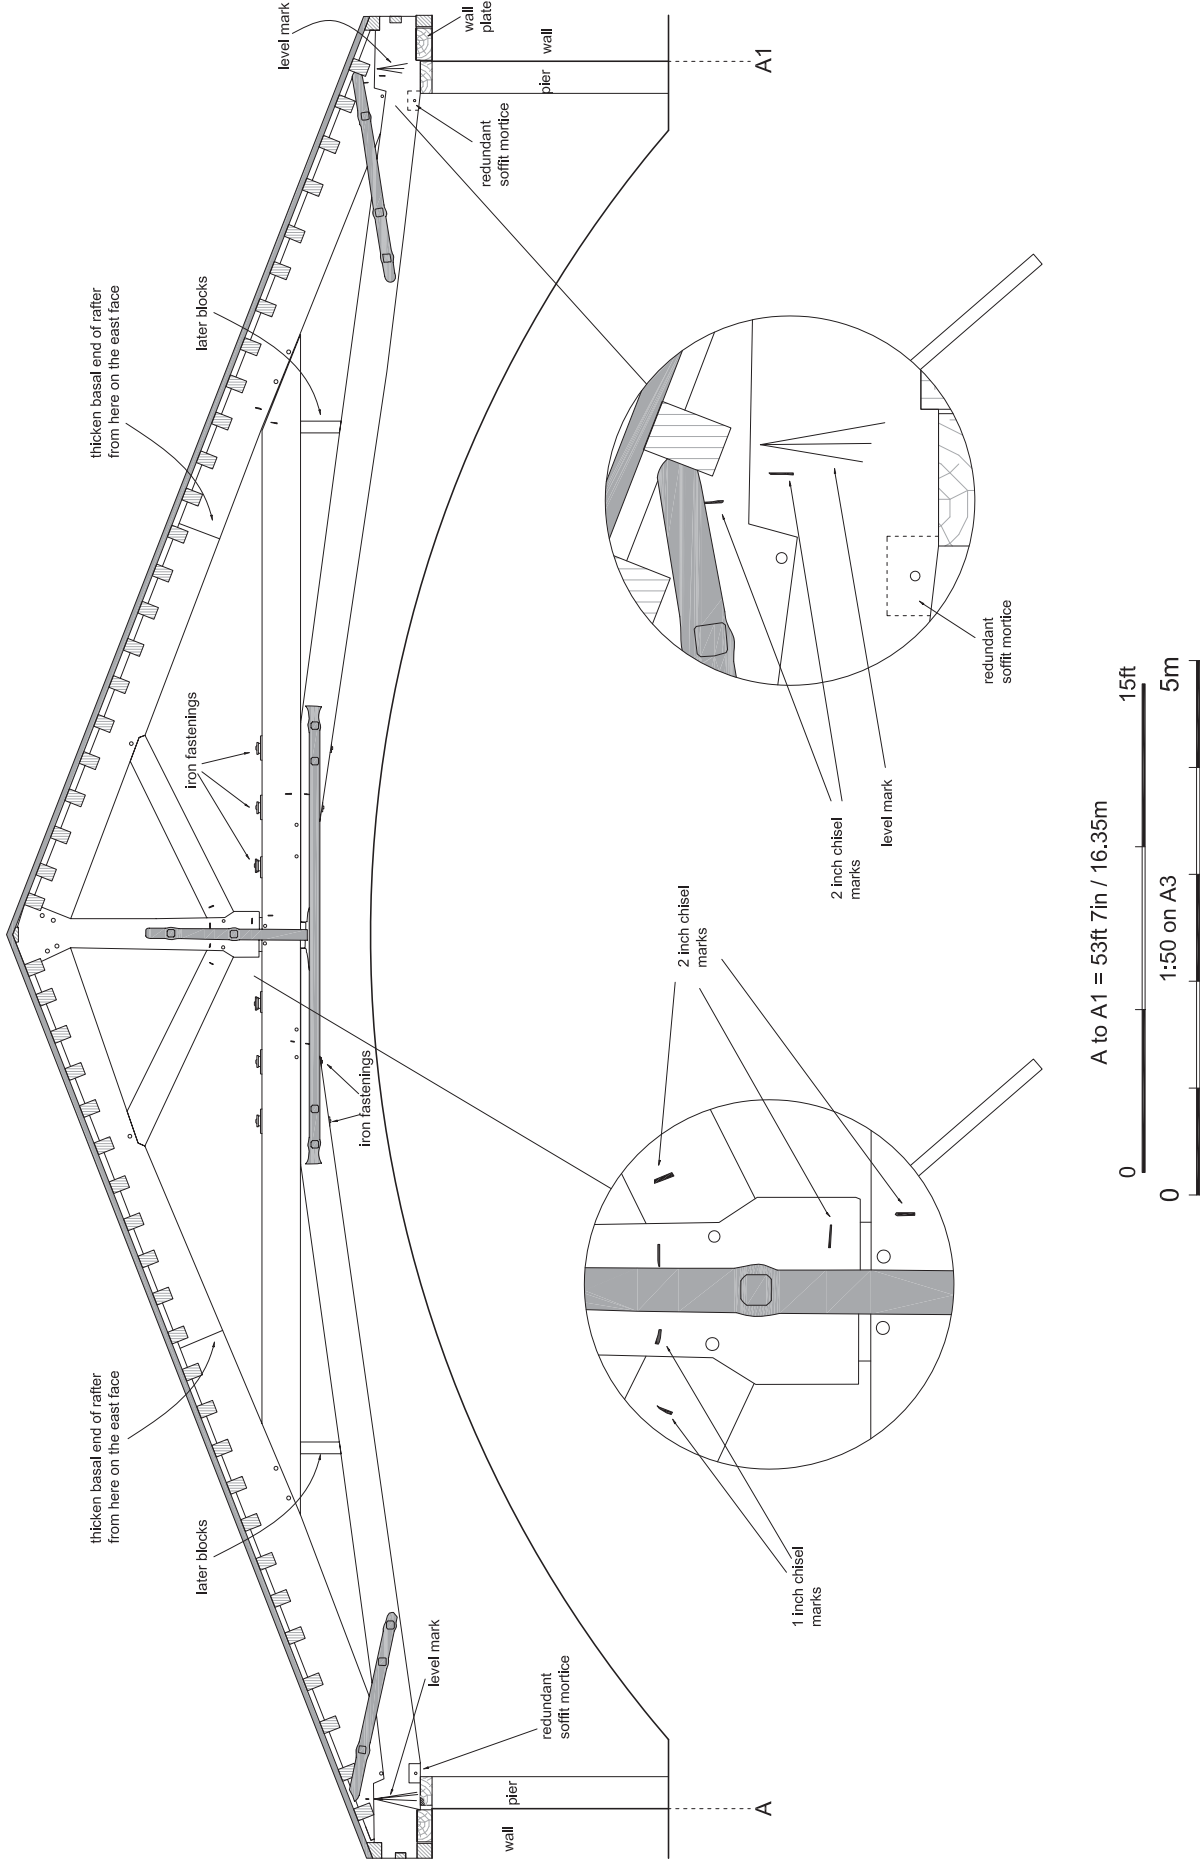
Elevation of the west face of Truss 15, above western dome, main roof of St Pauls cathedral nave, showings its form with a divided tie beam canted up to a low collar and king post assembly, carpenters marks, and original iron reinforcing.
